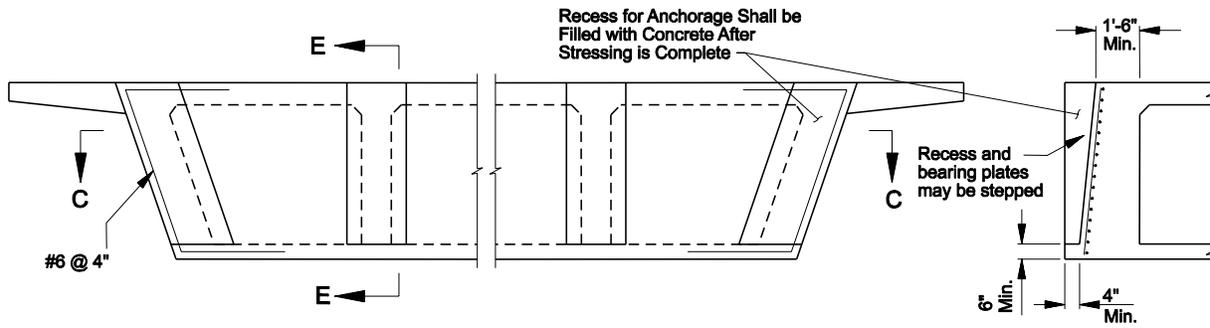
G](#) illustrates the typical NDOT design detail for a girder-end diaphragm with recessed anchorages. See the *NDOT Standard Plans* for an anchorage detail on the outside of end diaphragms.
